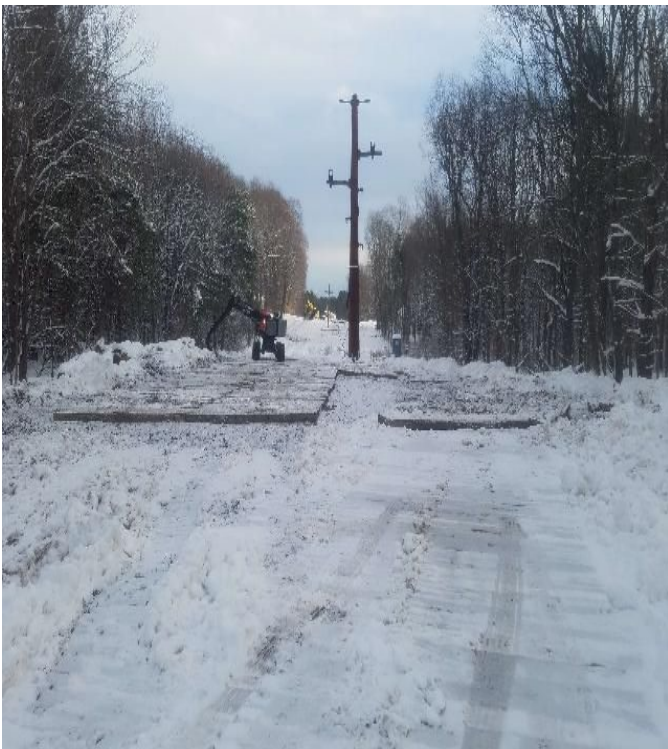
Building work pad around Str 107 for cable pulling activities. Viewing east. (12-04-19).
